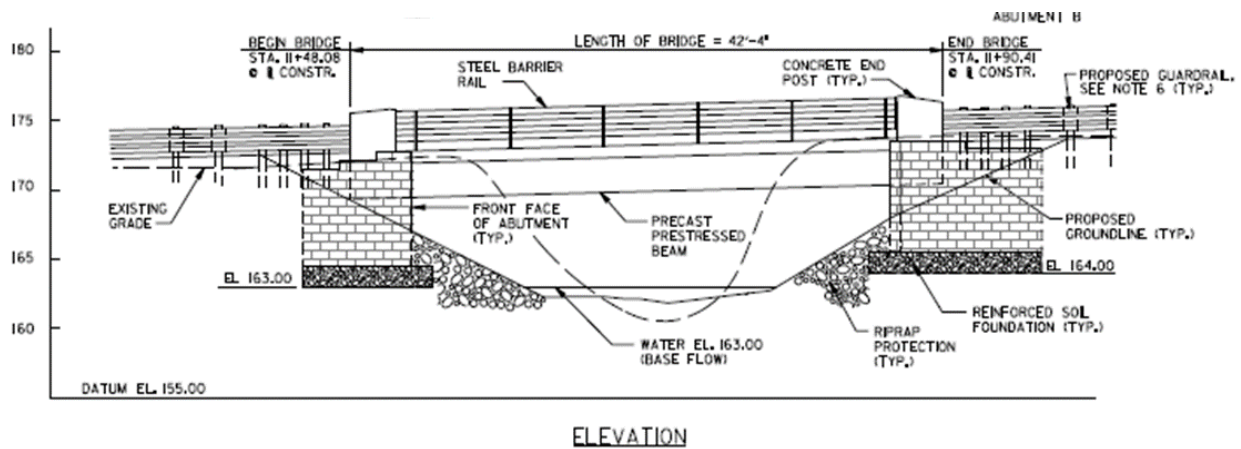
Diagram. Elevation view diagram of the proposed bridge.
